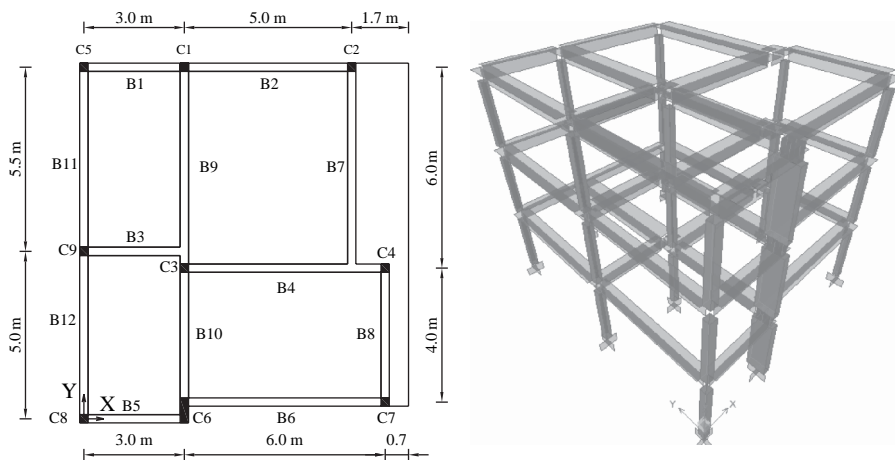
Standard floor plan and 3D view of the SPEAR building.
